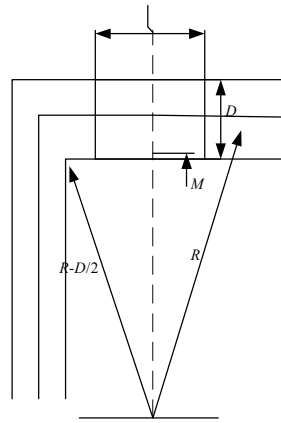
Schematic diagram of overcutting of straight pipe jacking
